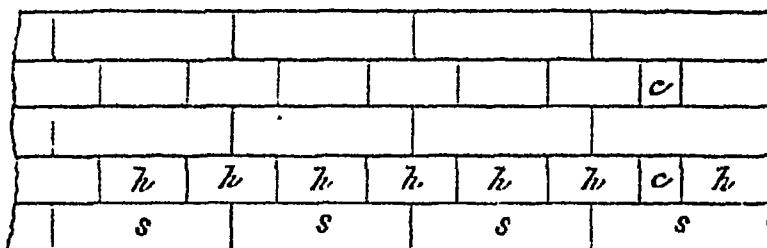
shows the elevation of a brick wall built in English bond. *h, h* are headers, *s, s* stretchers, *c, c* closers. Scale = $\frac{1}{6}$.
